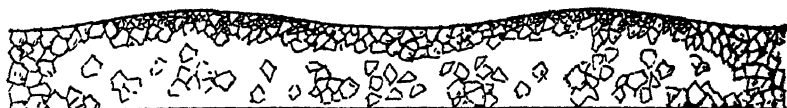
TYPICAL SECTION OF WAVY WATERBOUND MACADAM ROAD.
